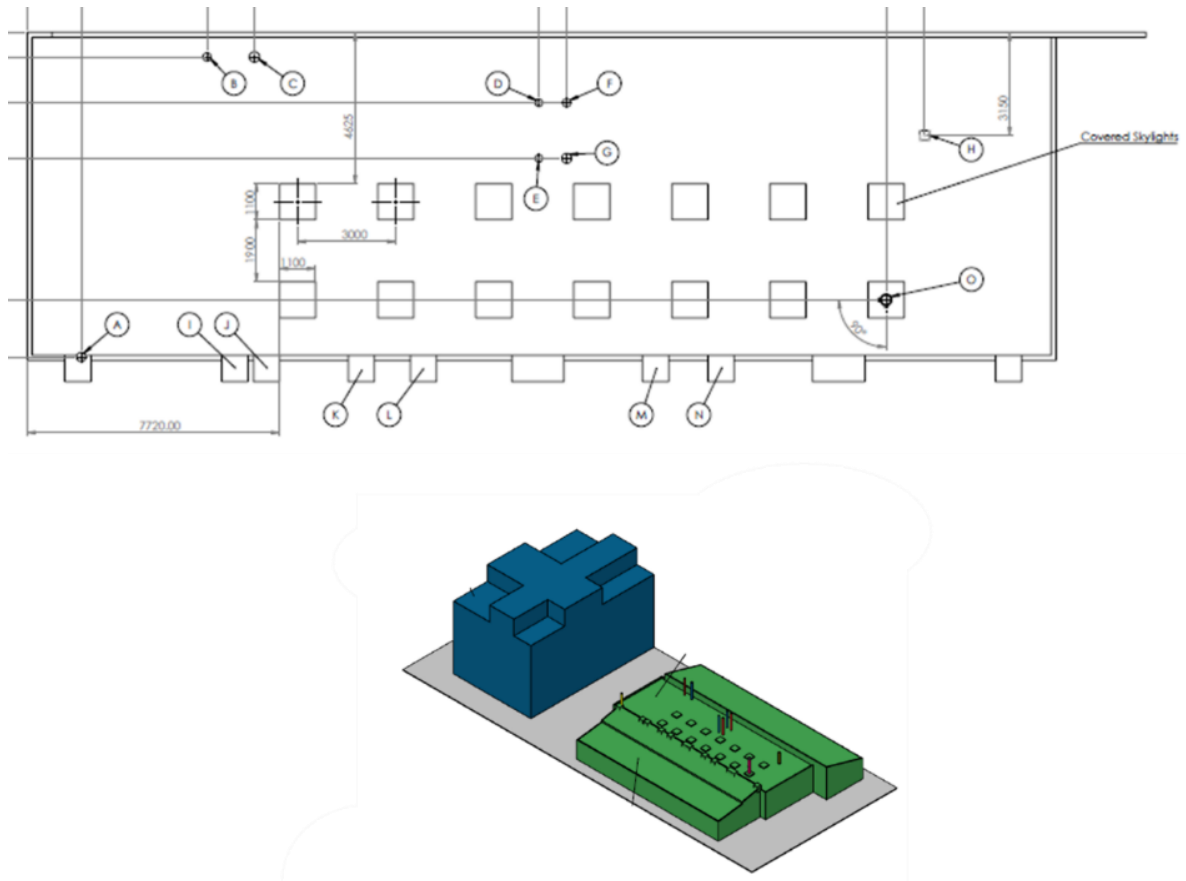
Site Layout (Top Image Shows 2D Layout, Bottom Image Shows 3D Layout)
